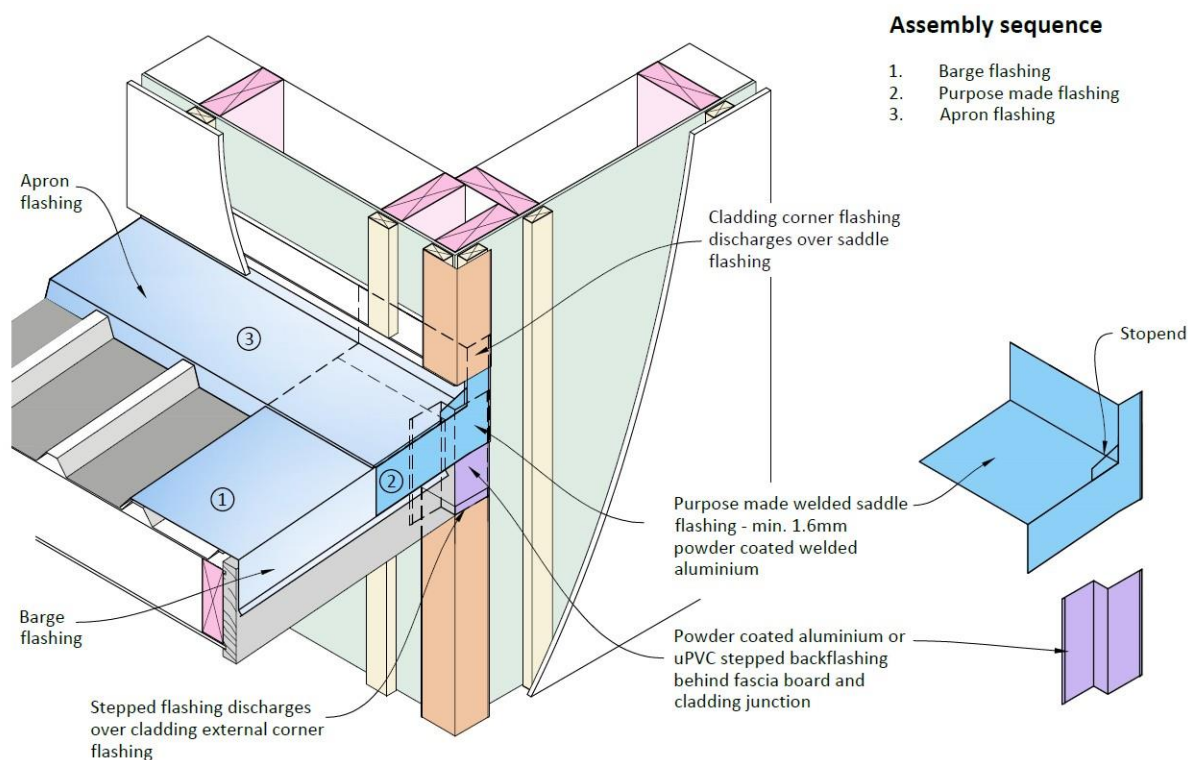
Example of 3D Junction - Barge Flashing at a Corner Wall
